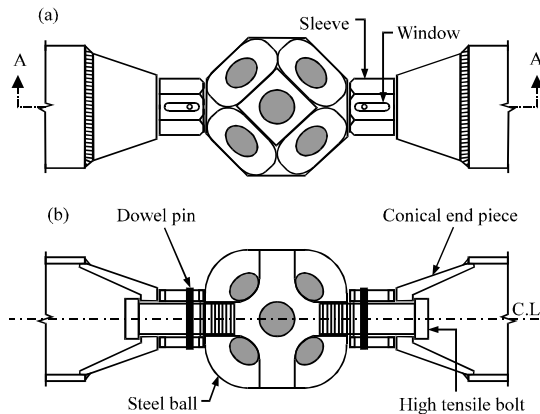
Details of MERO jointing system. (a) outside view and (b) section A-A
